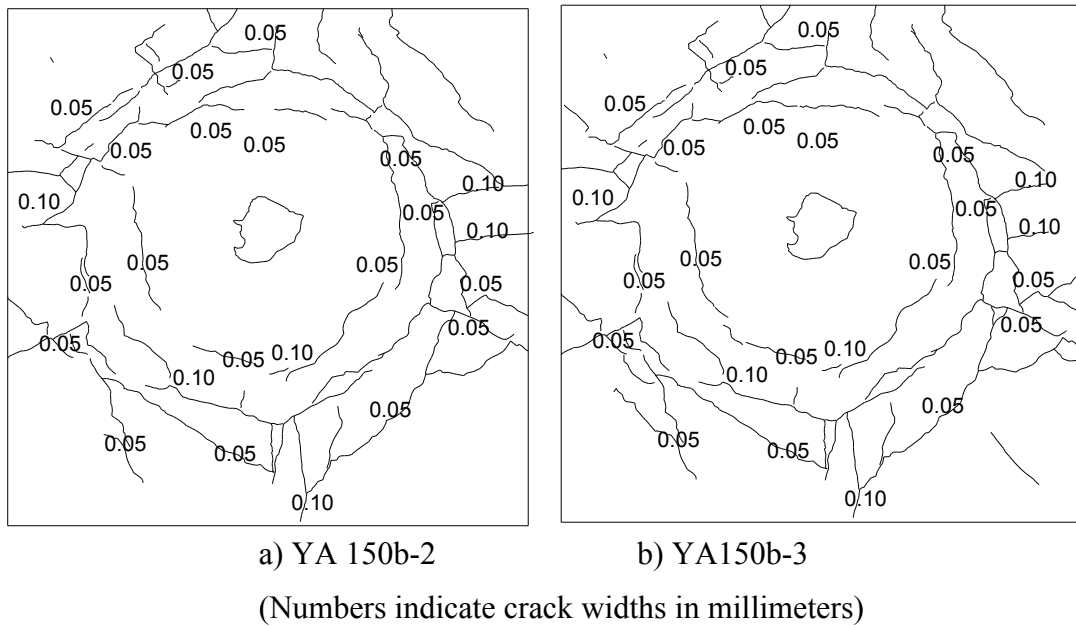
Crack profiles on the impacted face of the specimen YA150b
